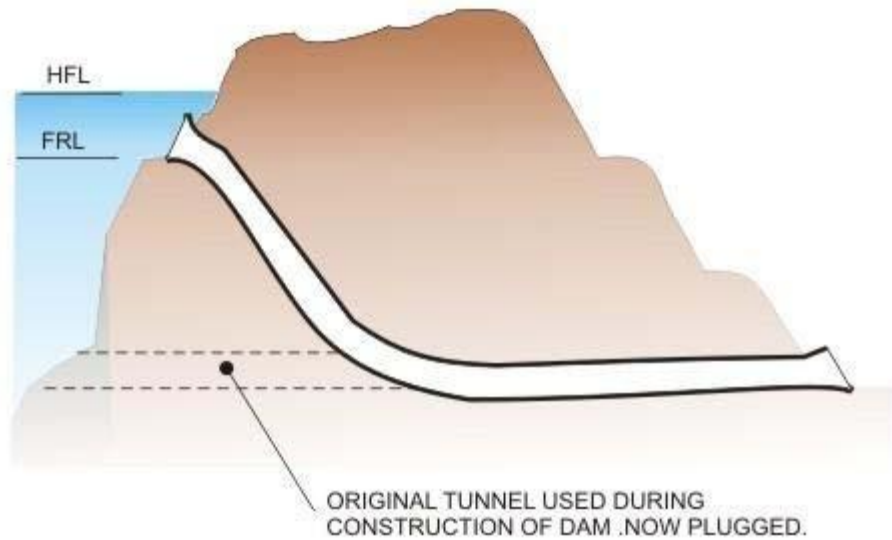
Bell mouth entry to a tunnel spillway (Gate control at entrance not shown)
